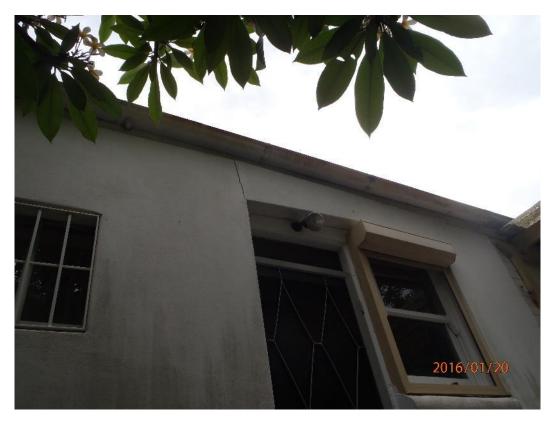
shows displaced brickwork adjacent to the window head arch outside the Bedroom 3 / Store room window.
